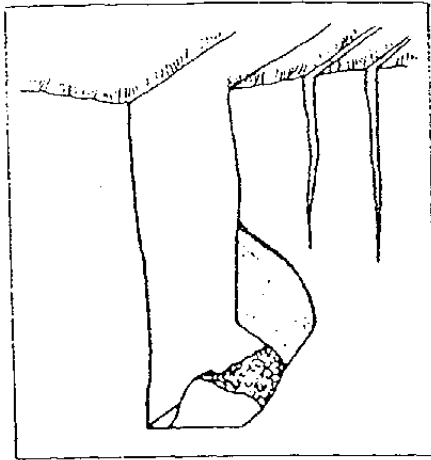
Next, the lower part of the trench wall fails under great stress from the weight of the soil above it.
